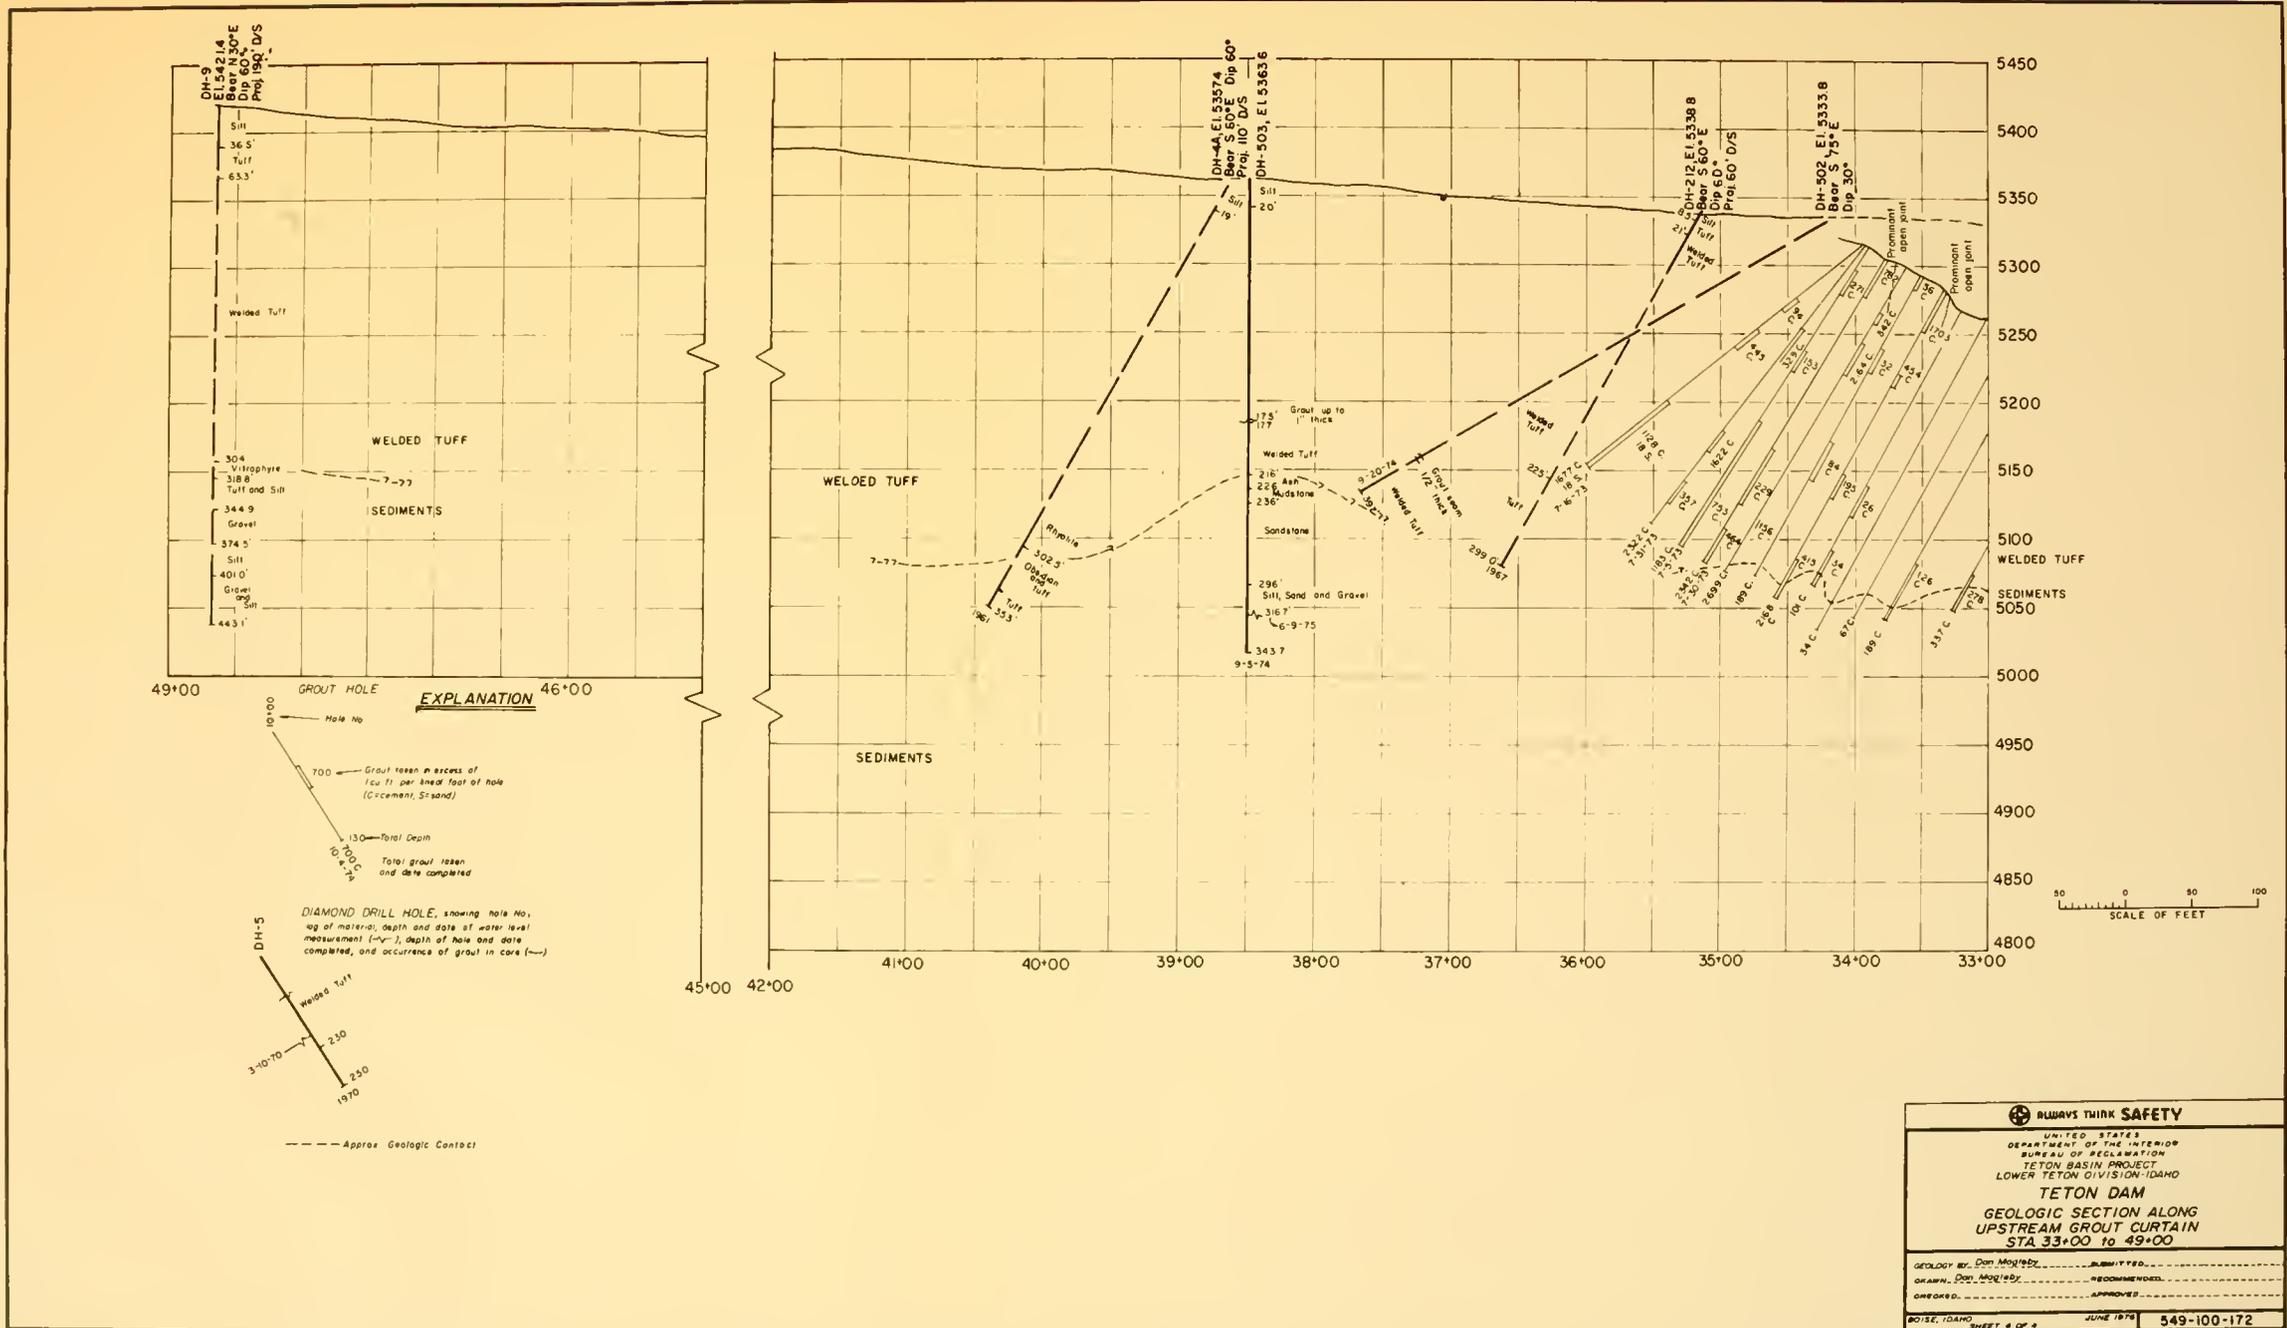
Geologic section along upstream row of holes of grout curtain, station —5+00 to station 49+00. (Sheet 4 of 4)
